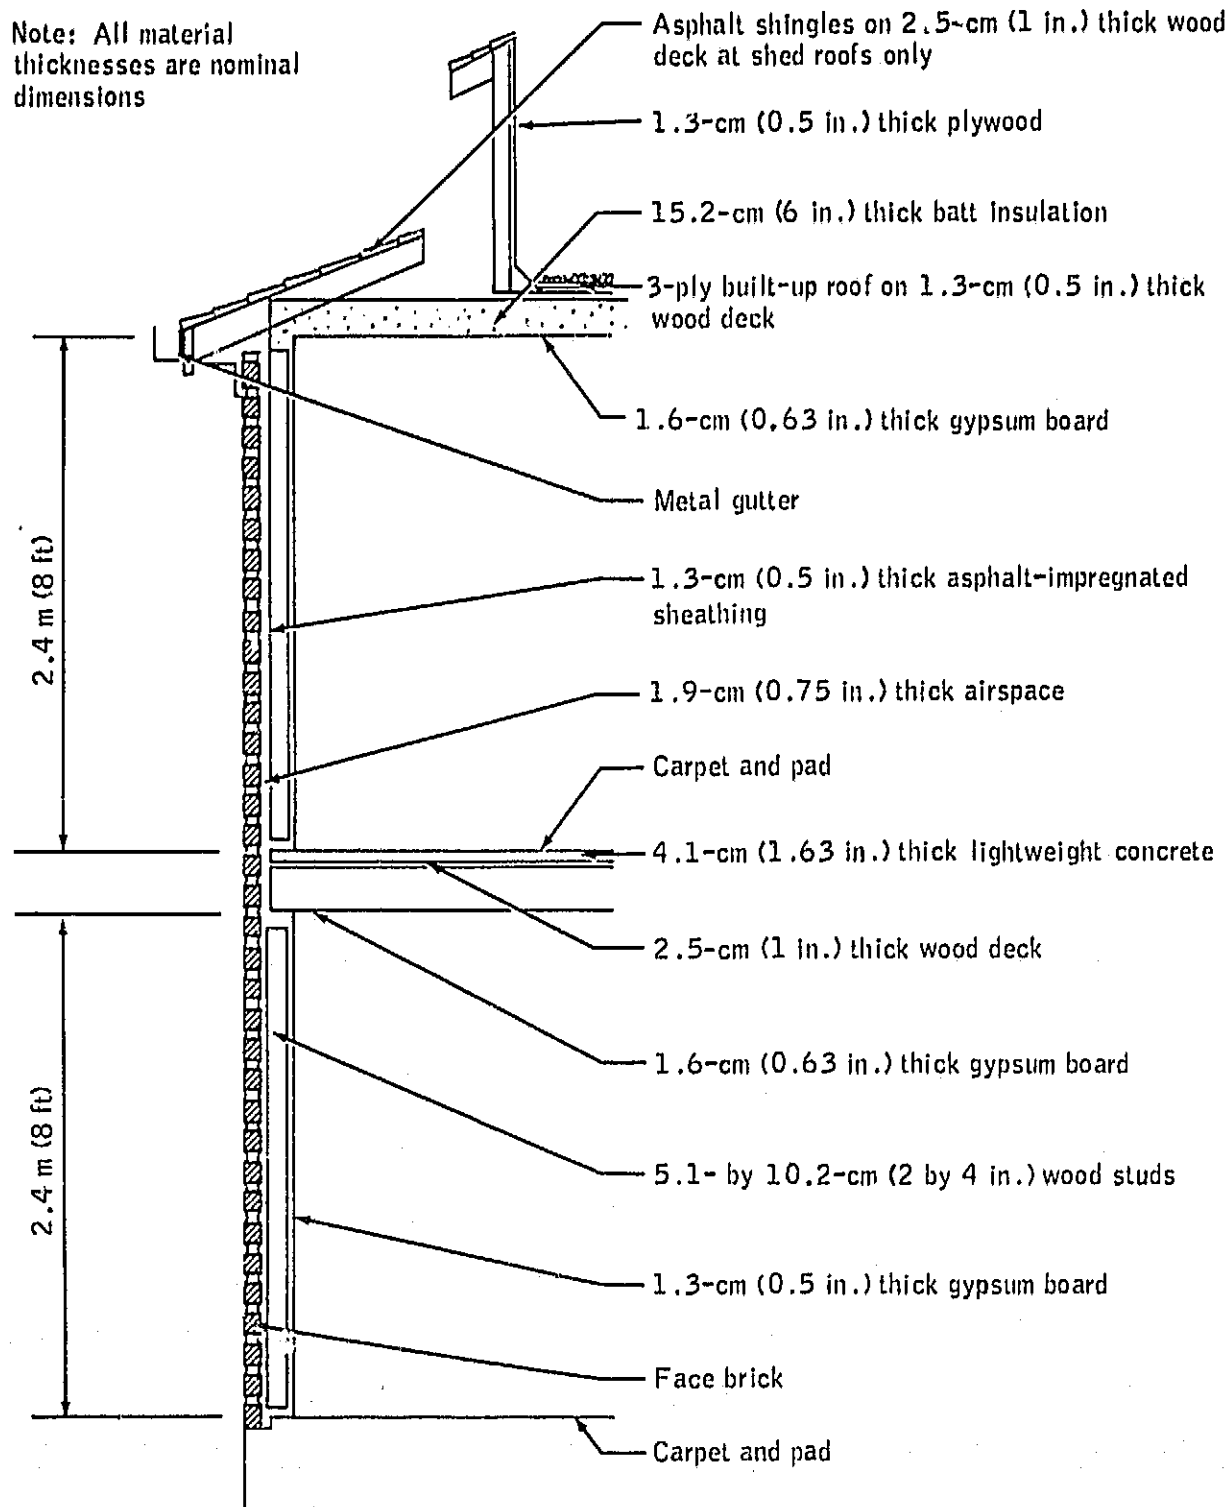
The 648-unit garden apartment complex typical outer wall construction.
